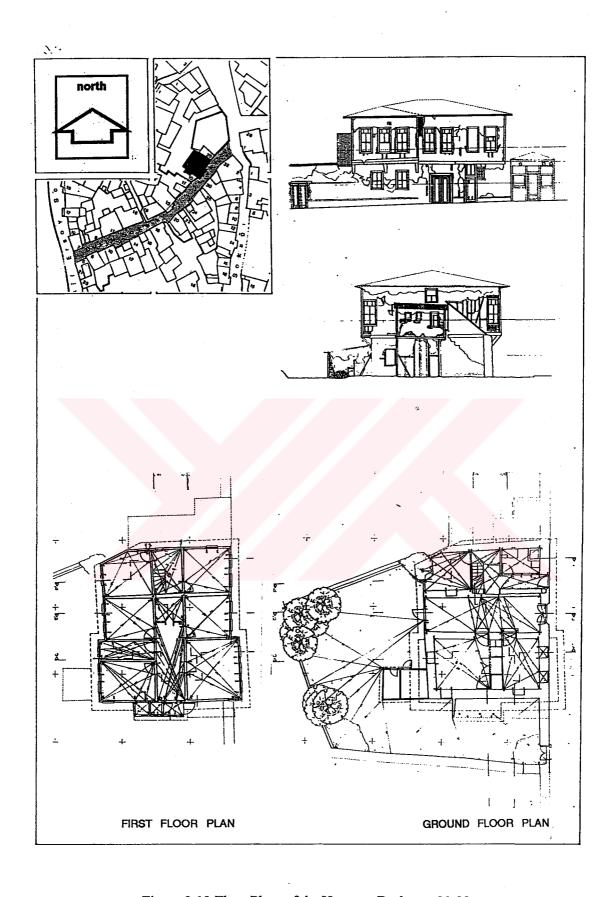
Floor Plans of the House at Dutlu st., 21-23.
